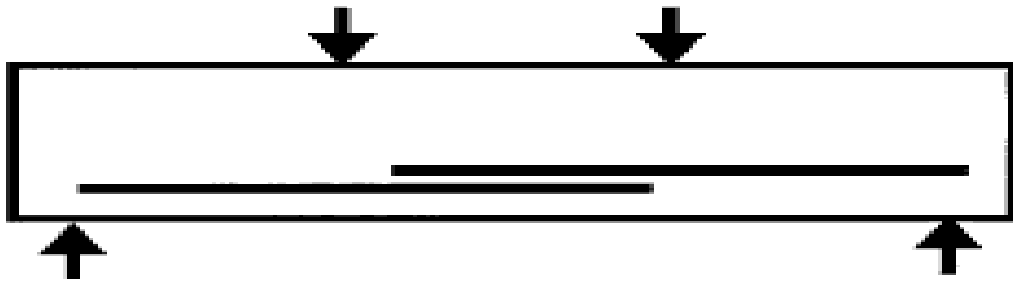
Splice beam specimen (ACI 408R, 2003)
